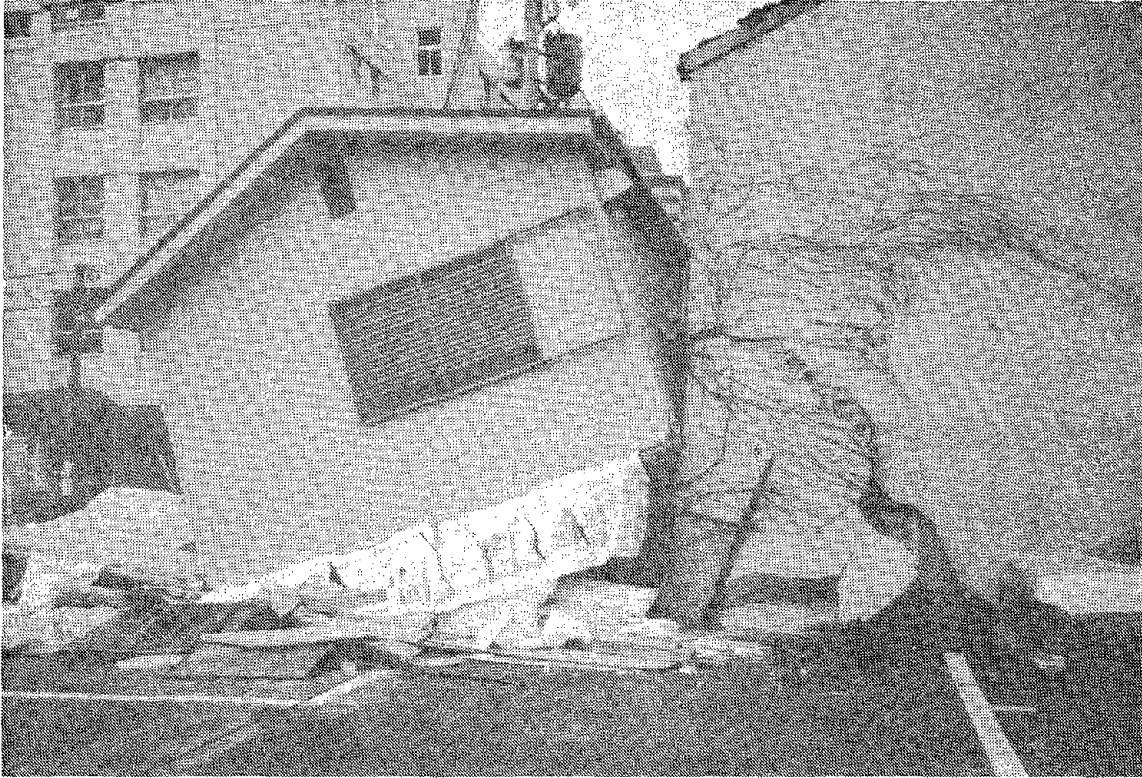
Soft story collapse of newly constructed building in Ashiya which slammed into older structure next door.
